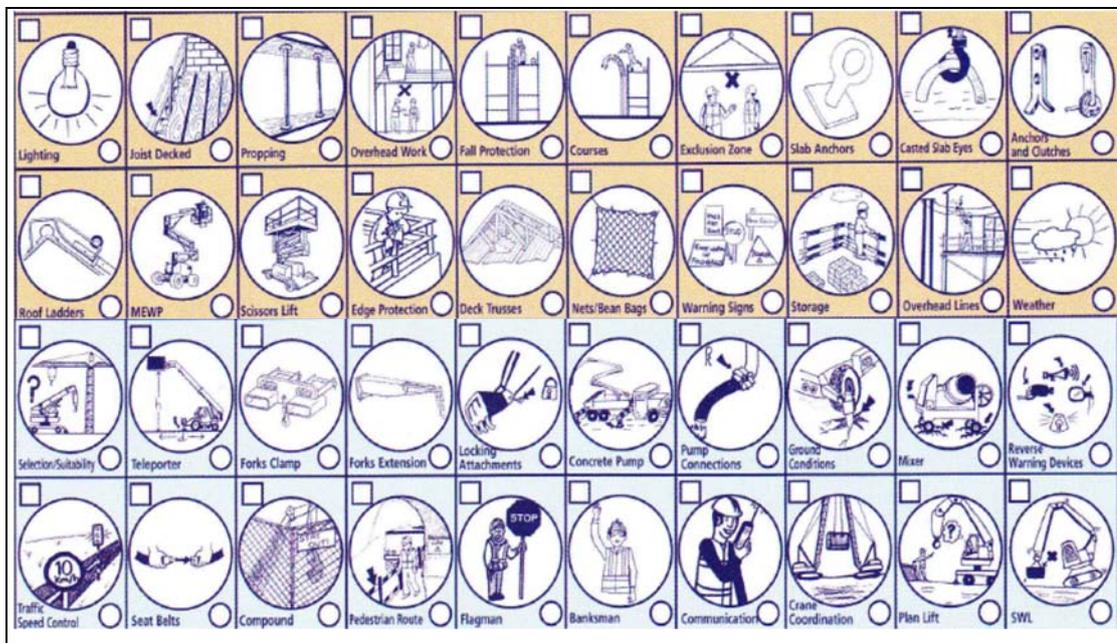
Extract from a Safe System of Work Plan for New Commercial Buildings
